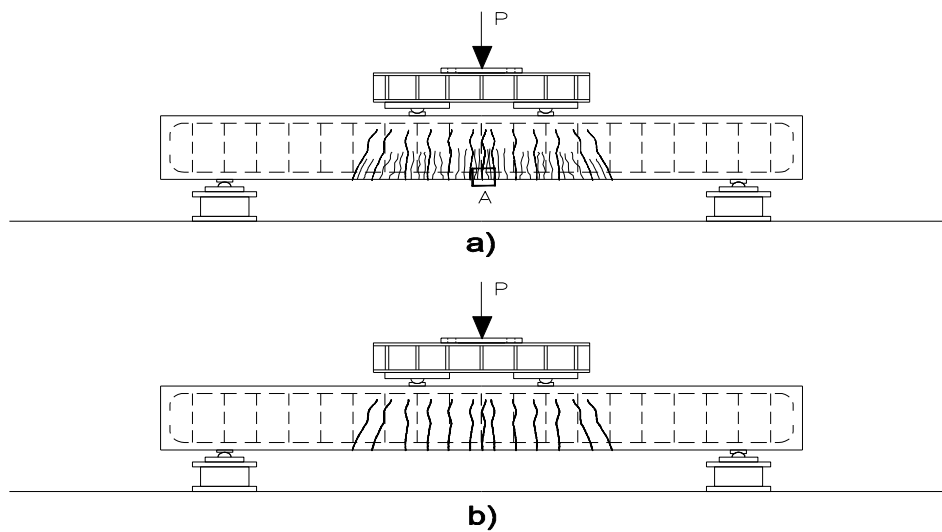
Comparison of the performance between two types of beams: (a) fibre reinforced concrete beam with longitudinal and transverse reinforcement and (b) standard reinforced concrete beam
